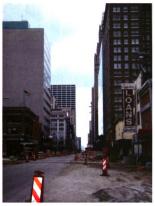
Main Street Improvement Project with the construction of the lightrail line along Main Street in downtown. (Source: Author)
